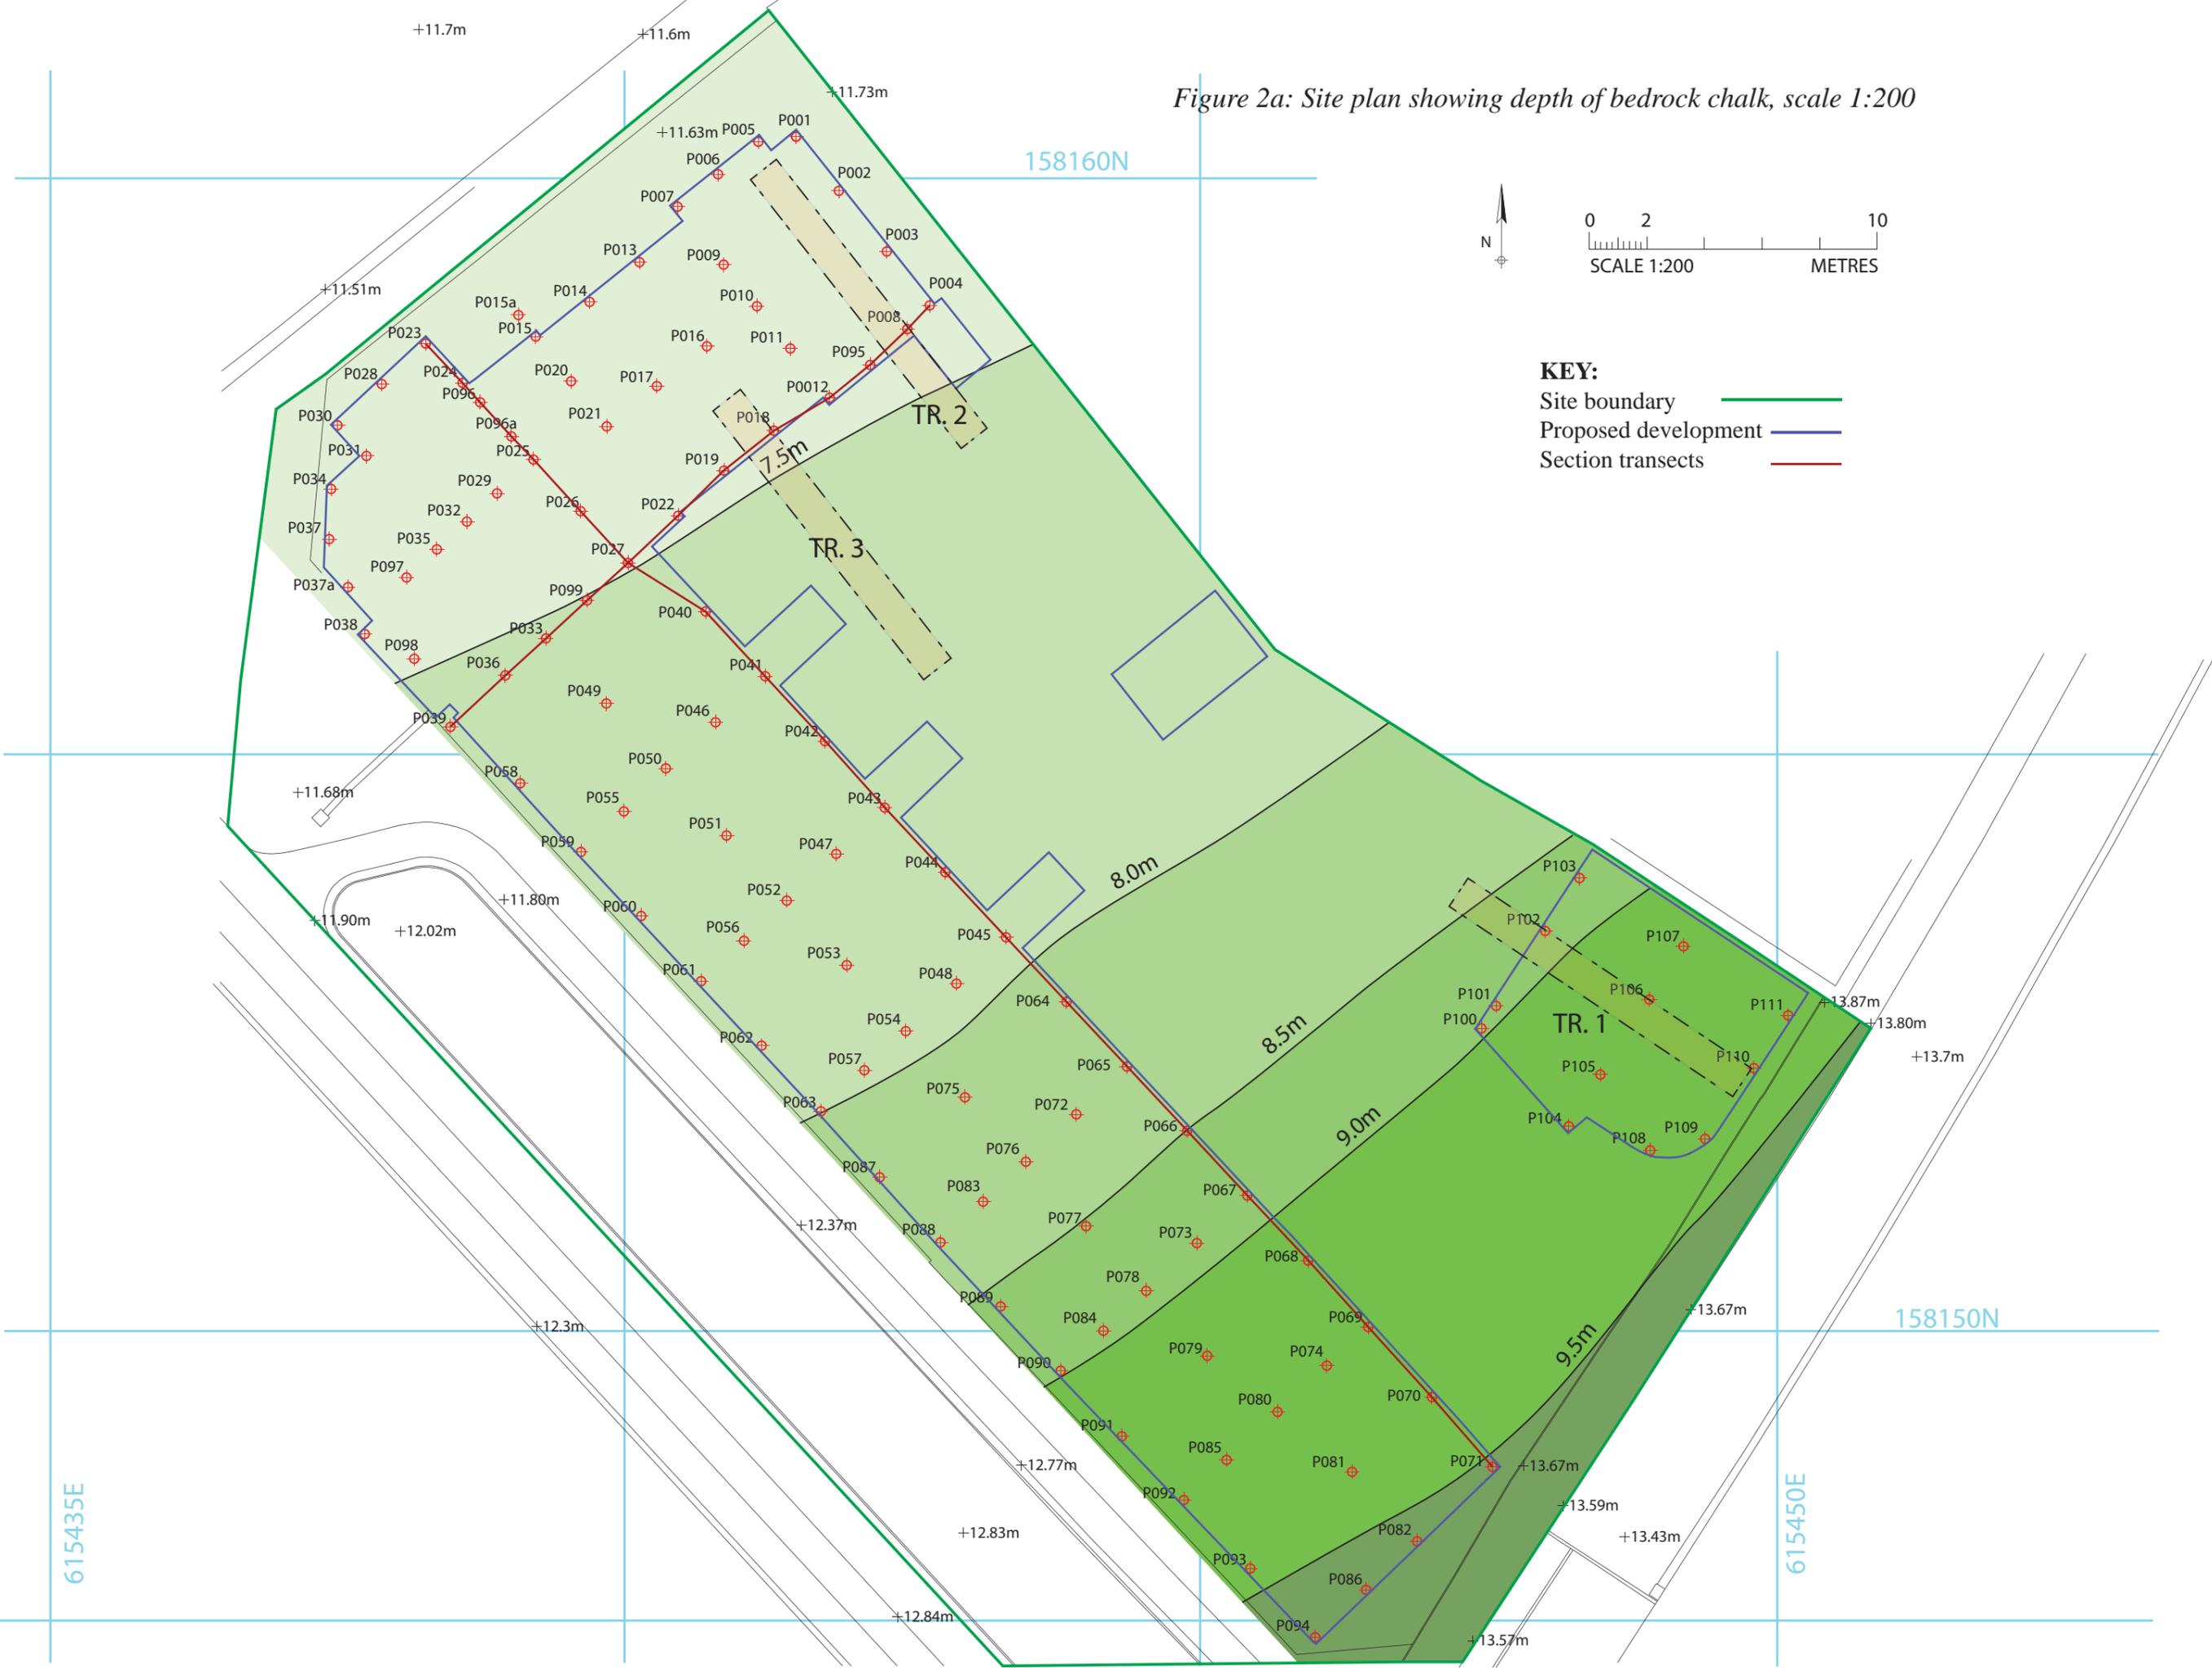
Site plan showing depth of bedrock chalk, scale 1:200
